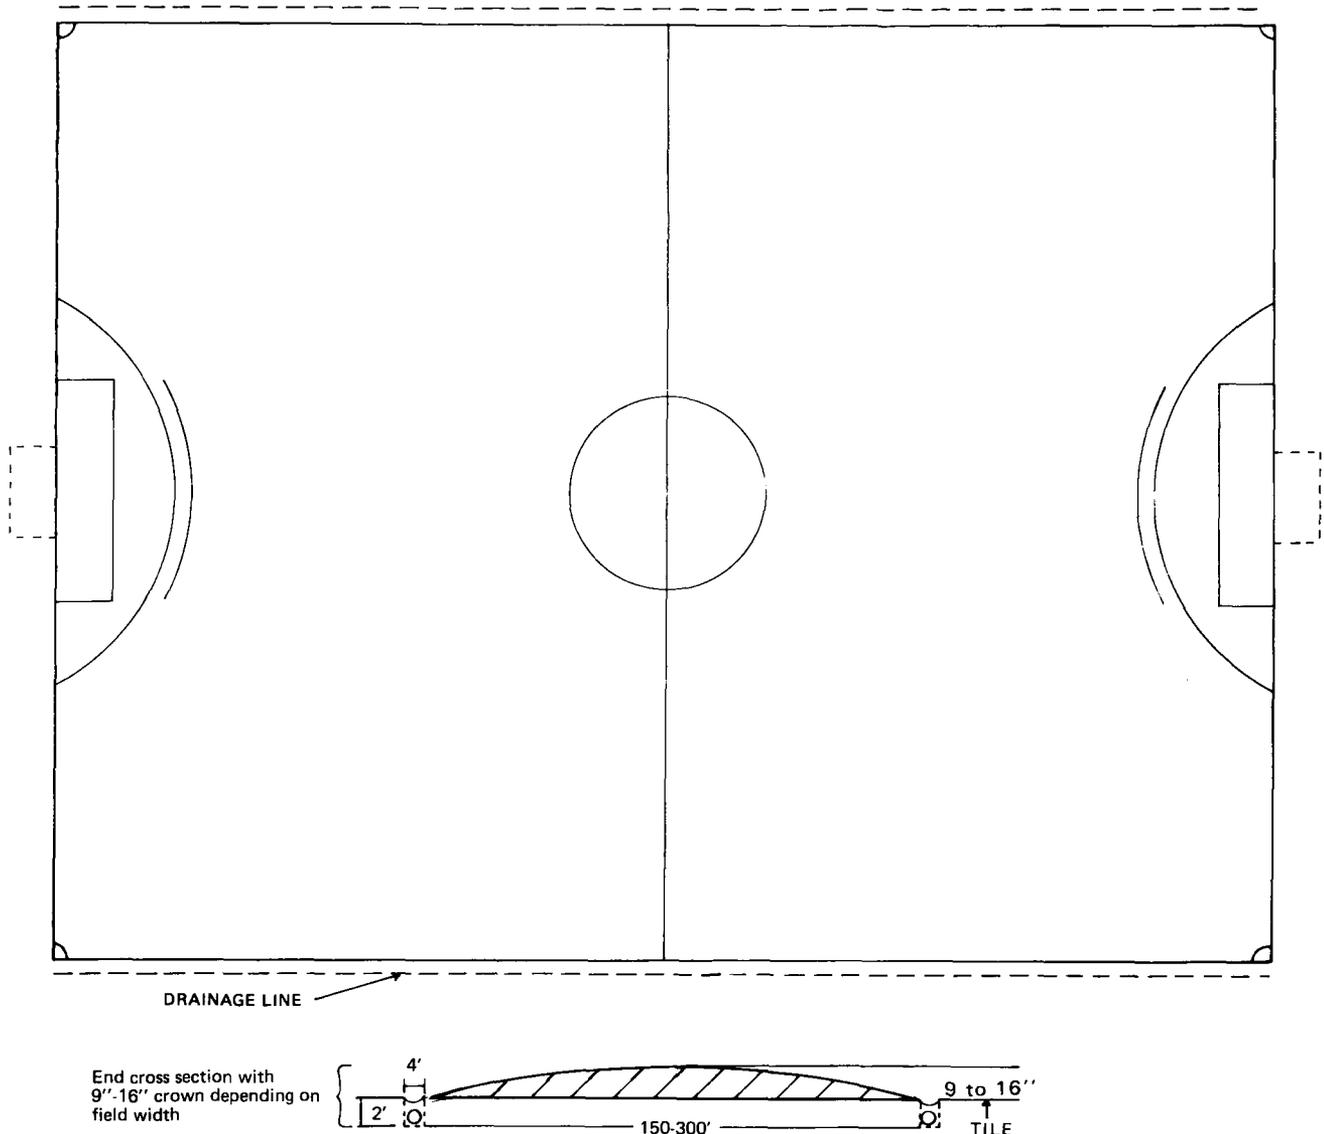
Diagram of a soccer field with plans and elevations for surface drainage and drainage lines.
